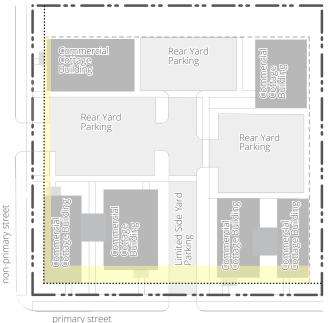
Commercial Cottage Building: Multiple Buildings on a Deep Lot
